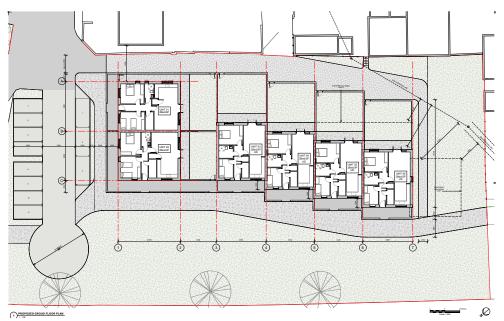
Design Option 1: Developed Site Plan for 7 no. units.
